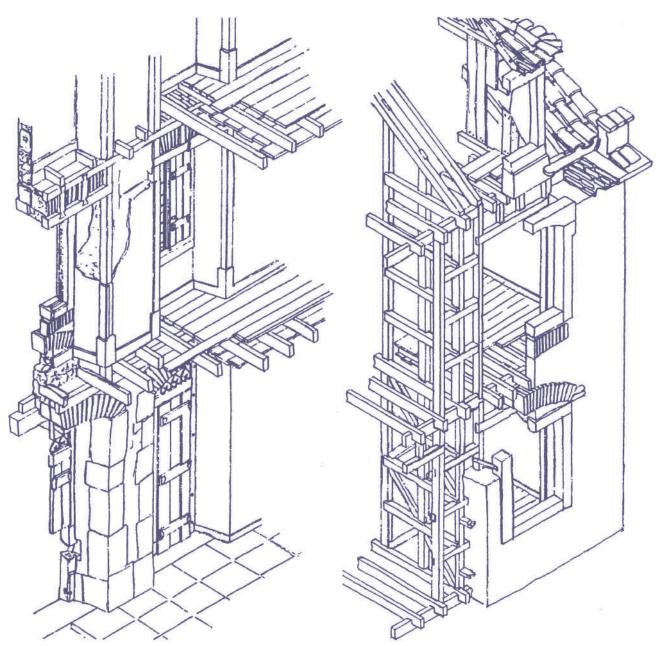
Articulation of the Gaiola Pombalina's wood structure with the exterior wall's stone masonry.
